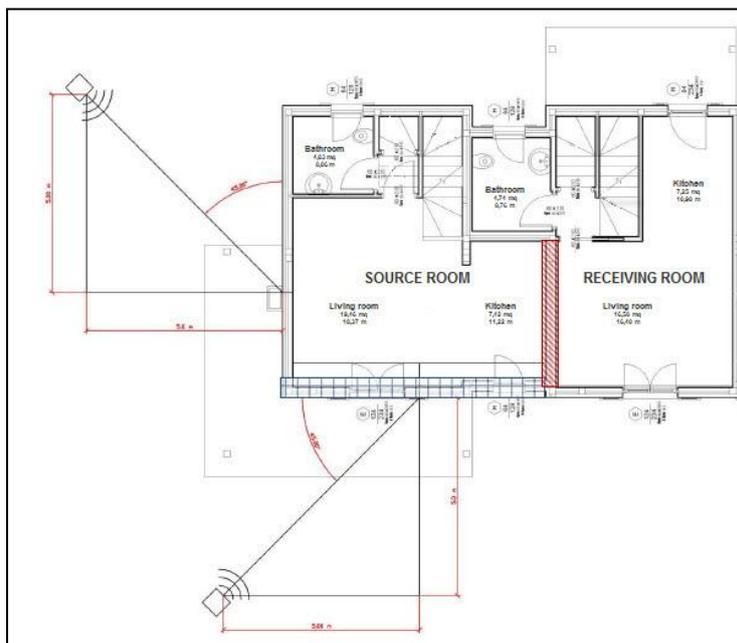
First floor: red = inner wall under test, blue = external façade under test.
